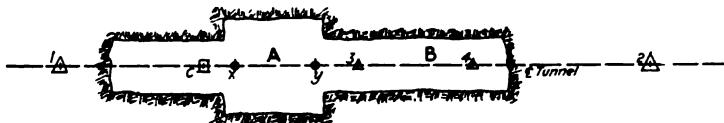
Plan of method of transferring the center line of a tunnel from the surface to the tunnel when the shaft is on the line of the tunnel.
